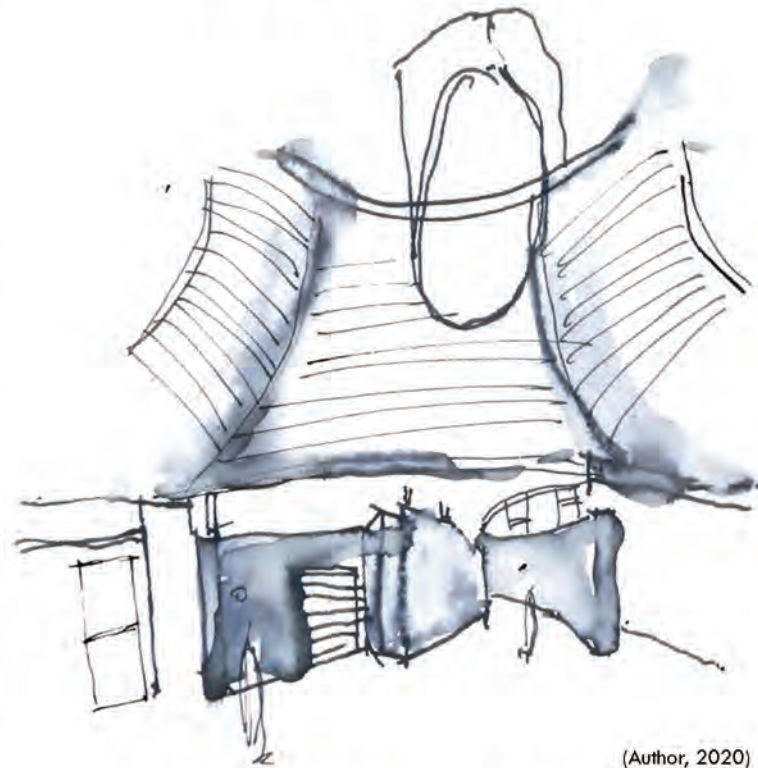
Steel structure penetrating the rammed earth wall at the outdoor shop
